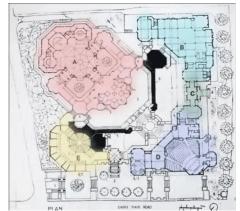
Plan (Source: Isckon Temple Delhi.pdf)
